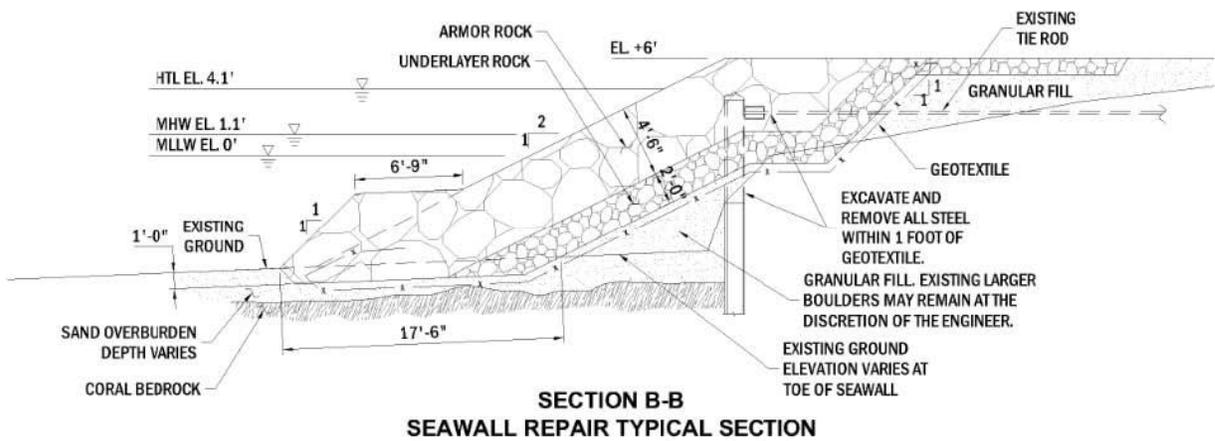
Cross-section of typical repair, note that original seawall will remain in place.
